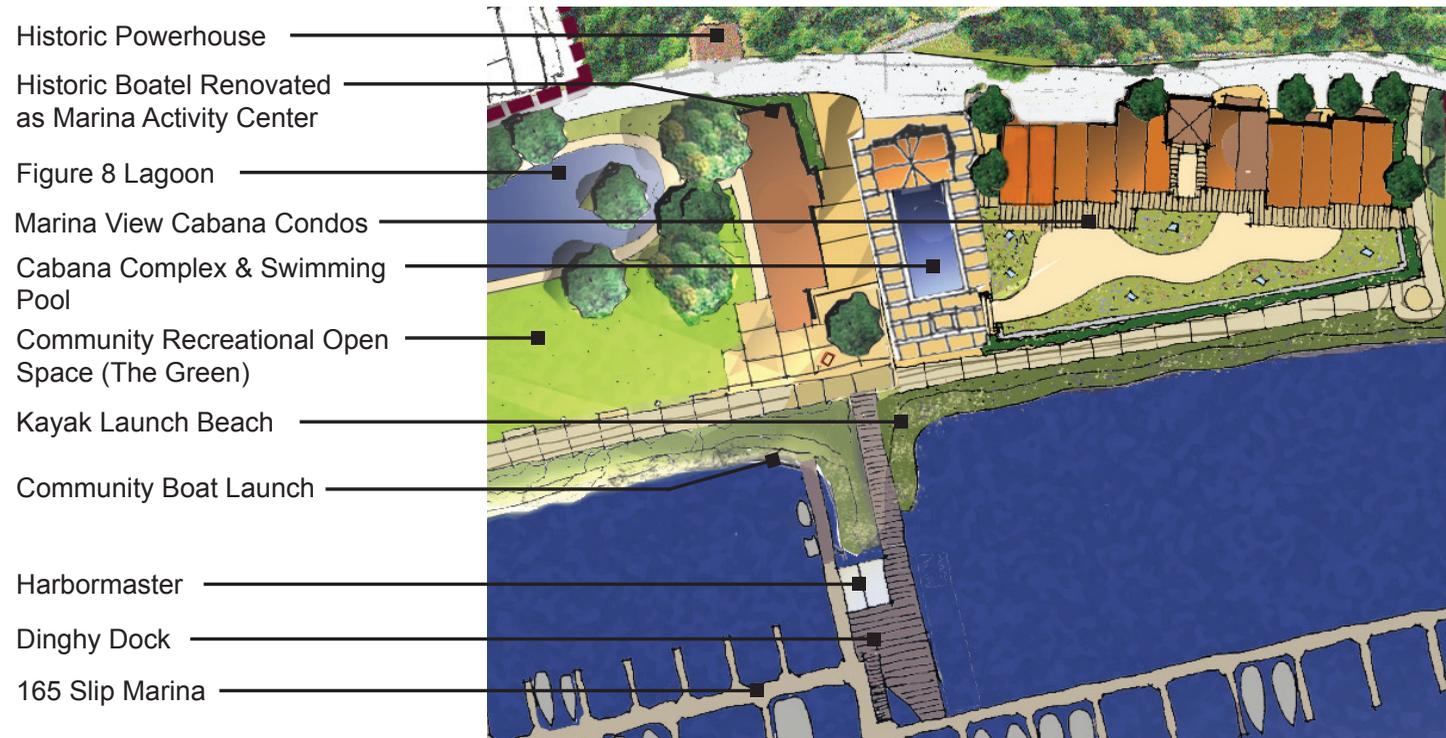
Detailed Site Plan of Boatel/Cabana Complex
